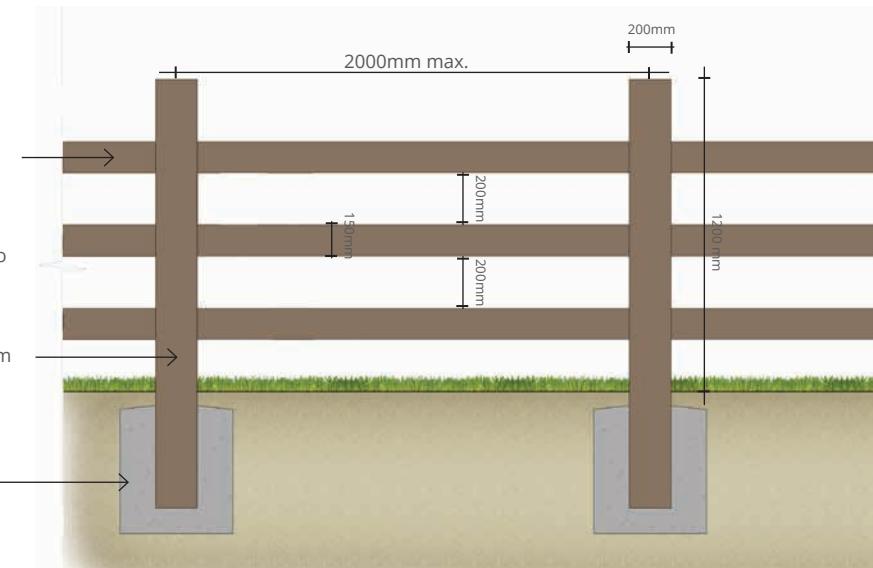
Typical Section- Dark hardwood Timber Post & Rail Fence. Mandatory.
